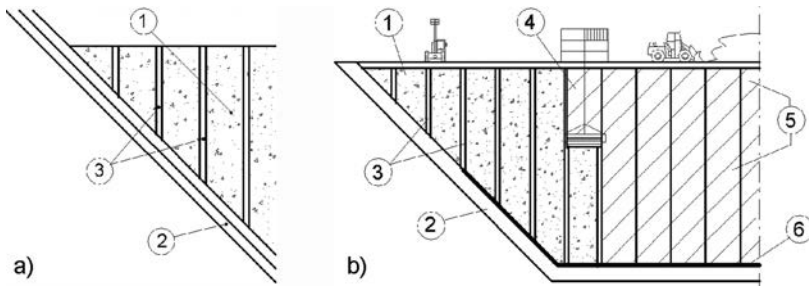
Scheme of face anchorage (a) and scheme of the placement of PVC sheets (b) (after Vaschetti & Scuero, 2009). (1) Base/anchorage layer; (2) concrete plinth; (3) PVC anchor strips; (4) PVC geocomposite sheets; (5) geocomposite sheets welded to anchor strips; (6) watertight perimeter seal.
